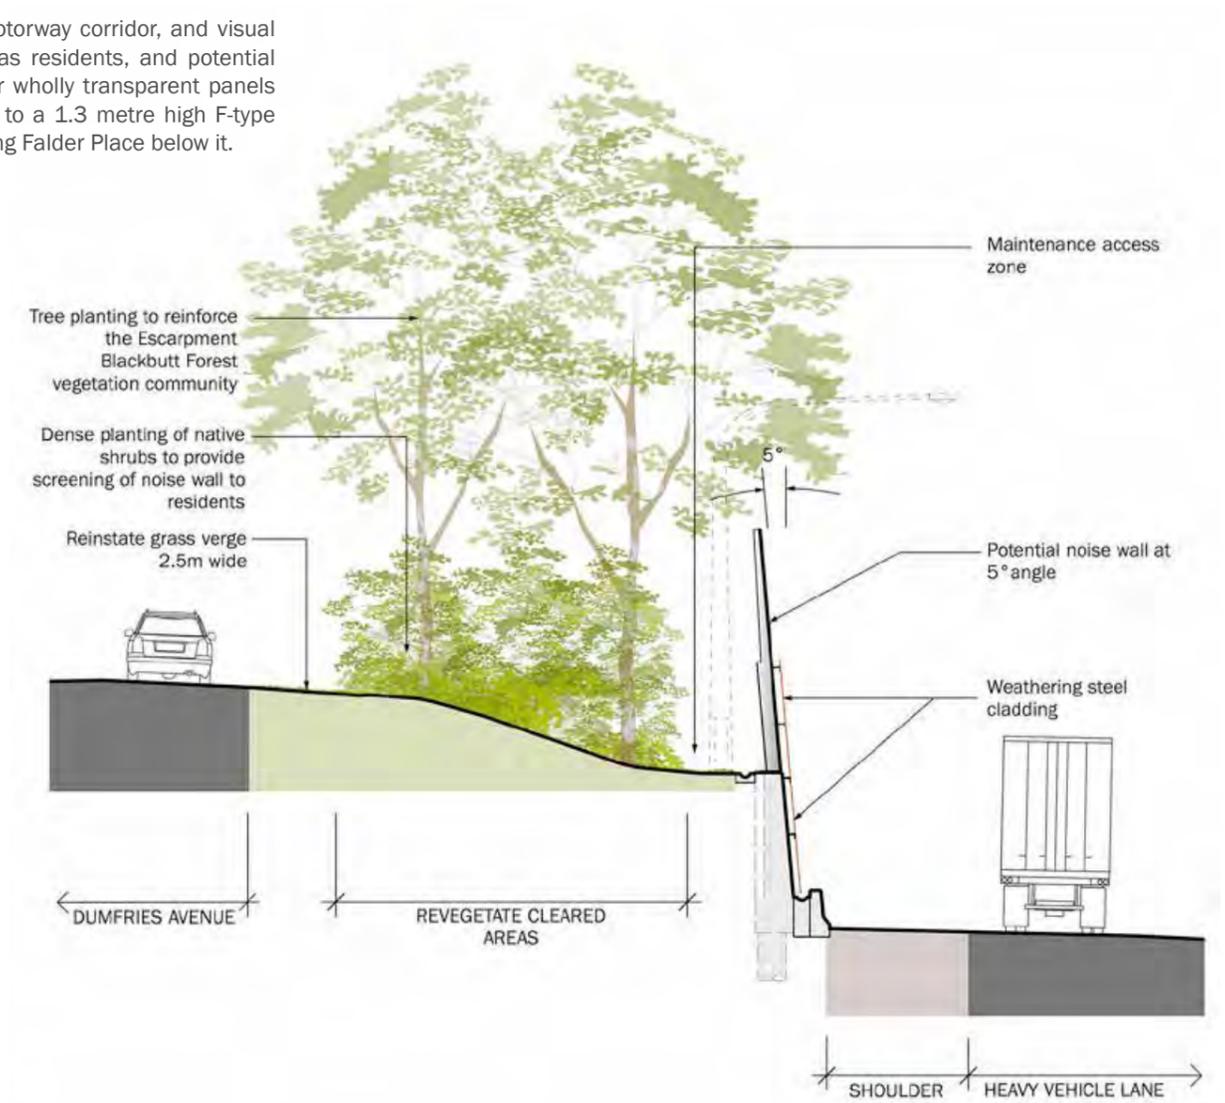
Typical section of feature noise wall facing Motorway - Finish type NW-F1 (Scale 1:150)
